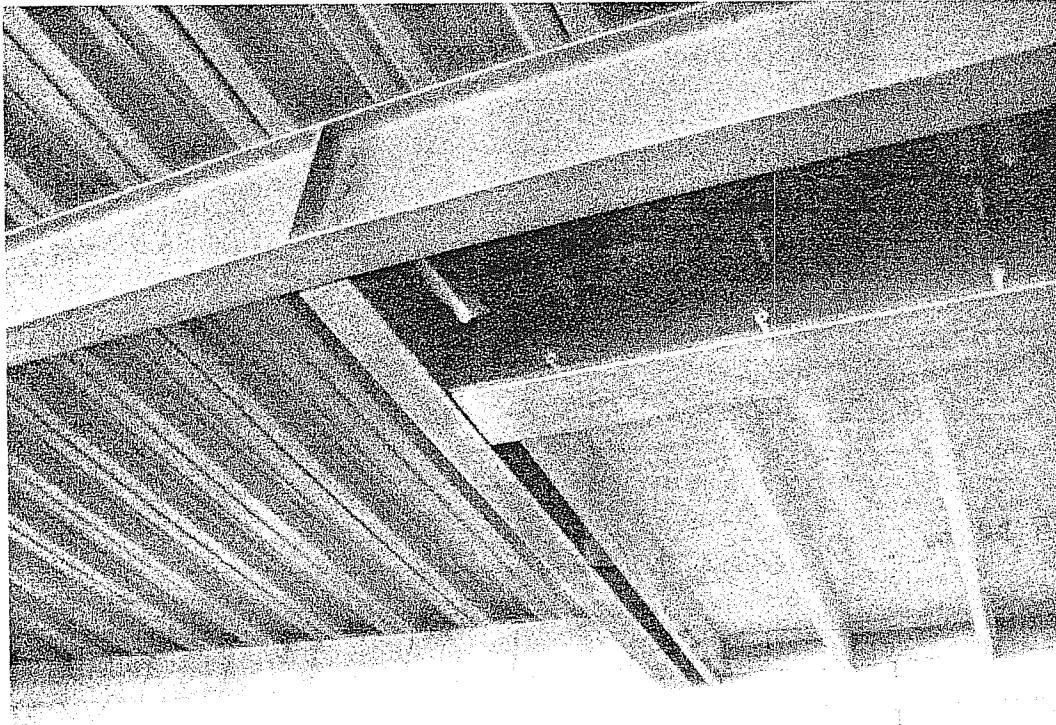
Steel framing below porch at second floor grid G./5.5.
